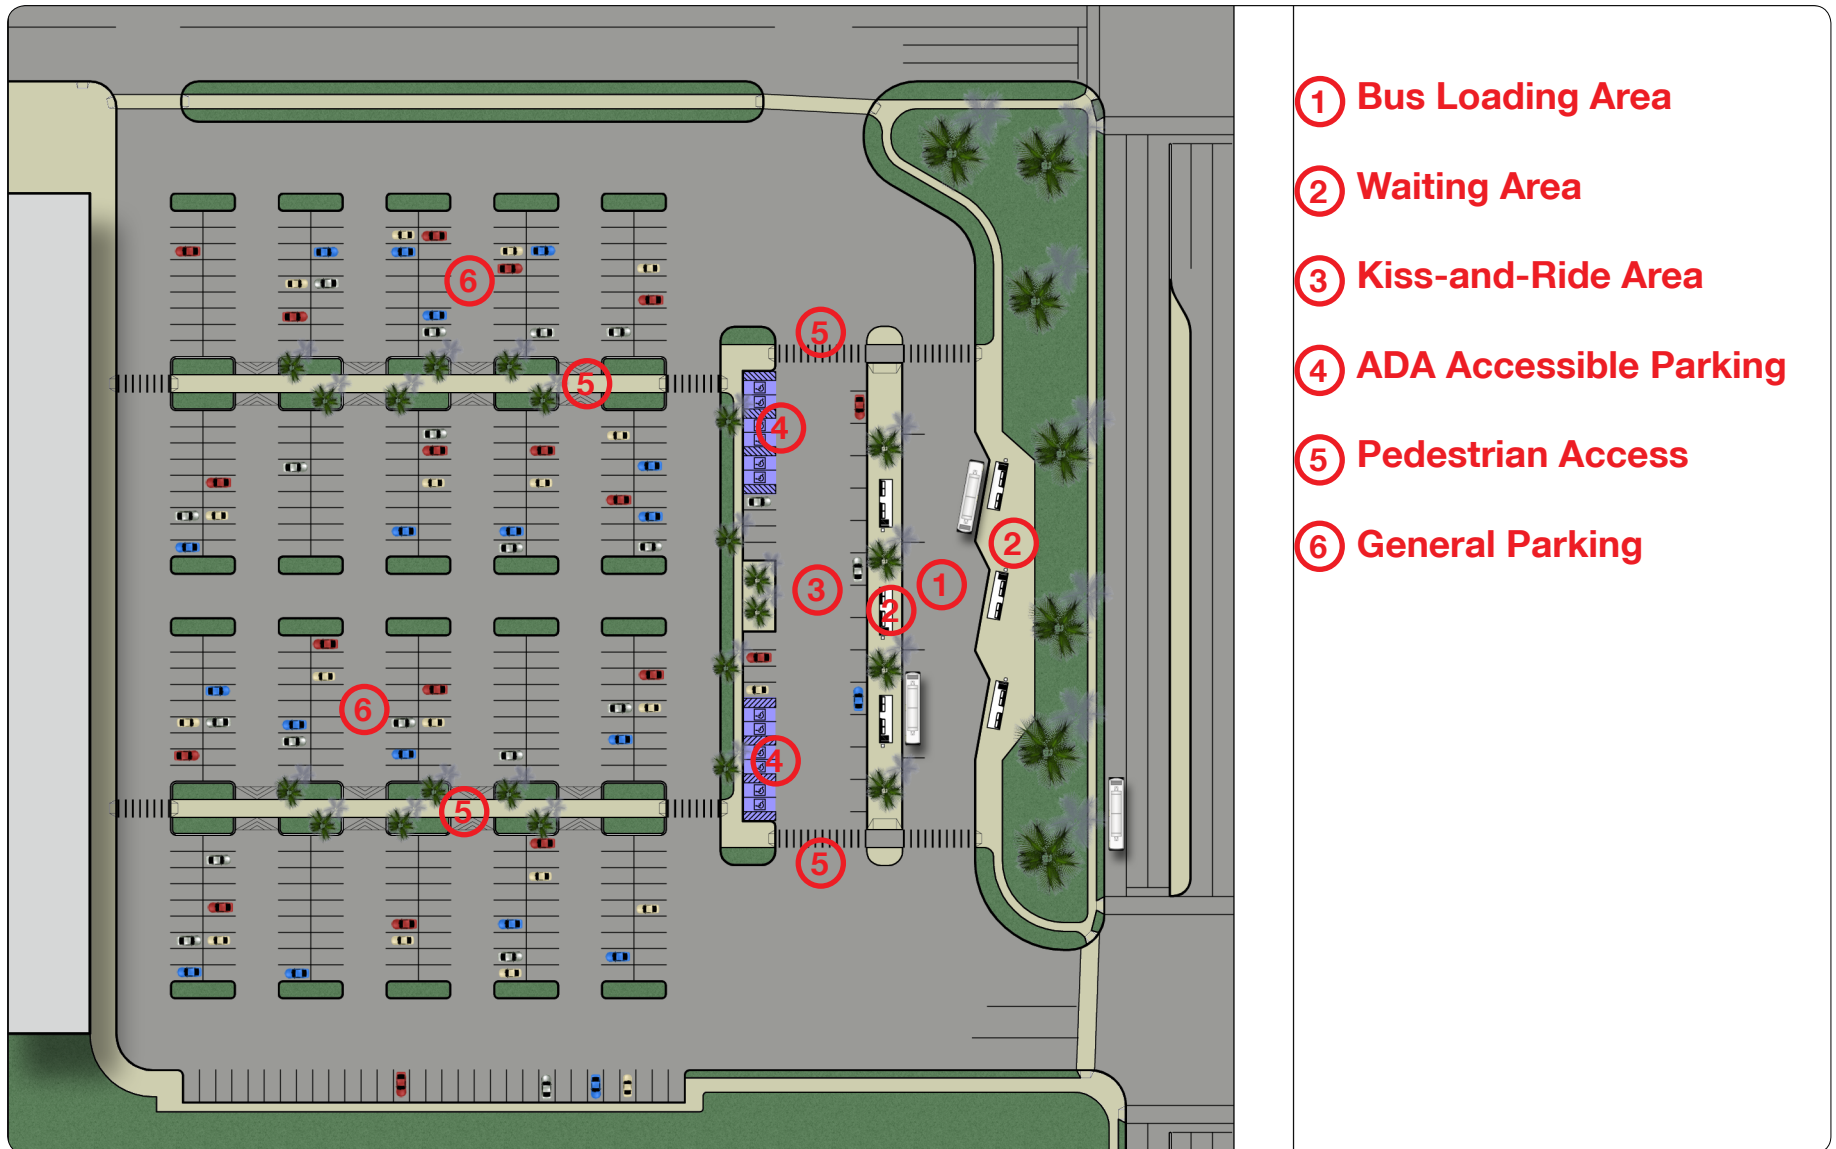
Typical Layout: Park-and-Ride Facility
